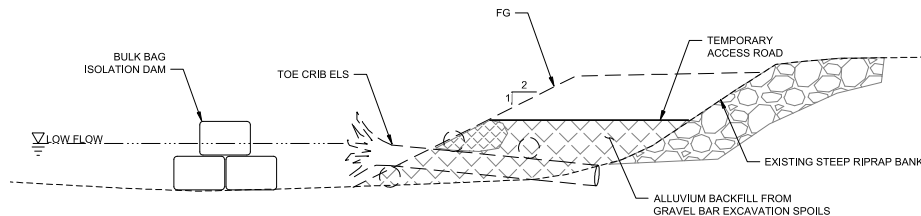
DETAIL - TYPICAL SINGLE BULK BAG ISOLATION
